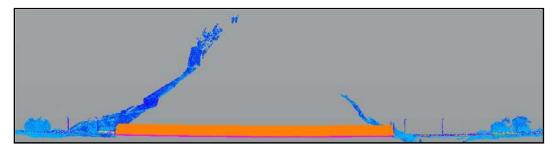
Cross section of Beavertail and LIDAR outside (showing partial over burden of the mountain). This data could be supplemented with terrestrial or drone LIDAR to give a full surface over the tunnel.
